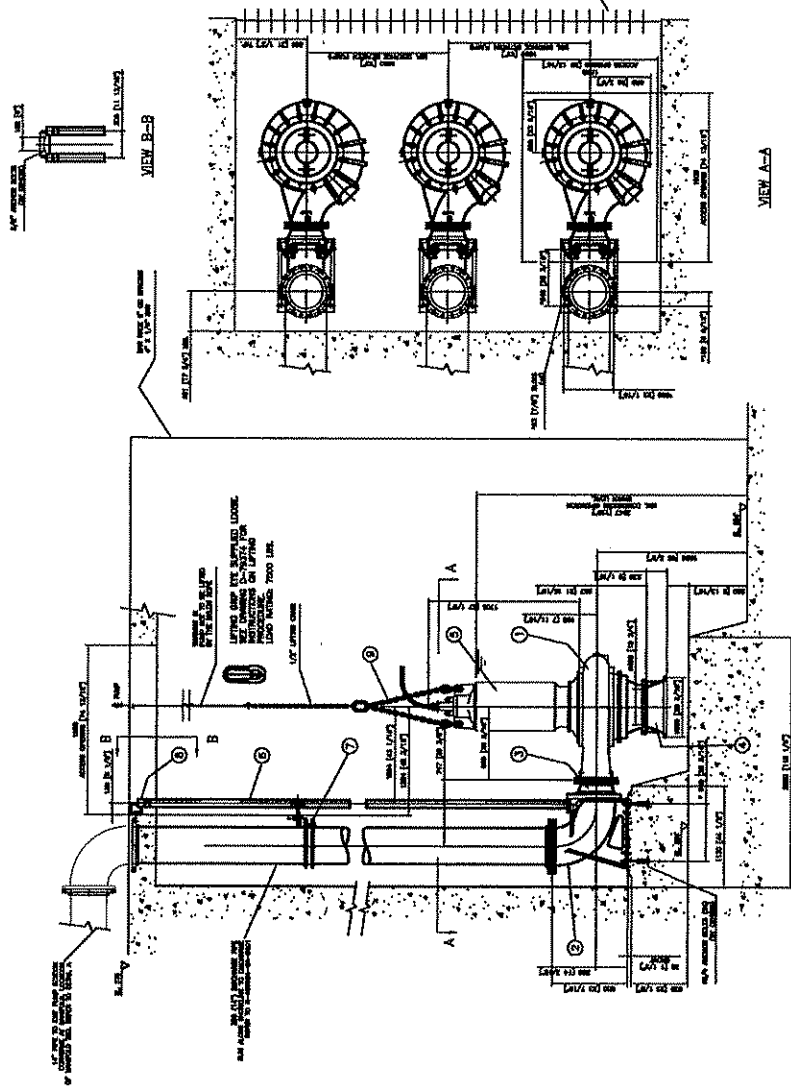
Fish pump assembly drawing (drawing K-409054-GA-0005)
